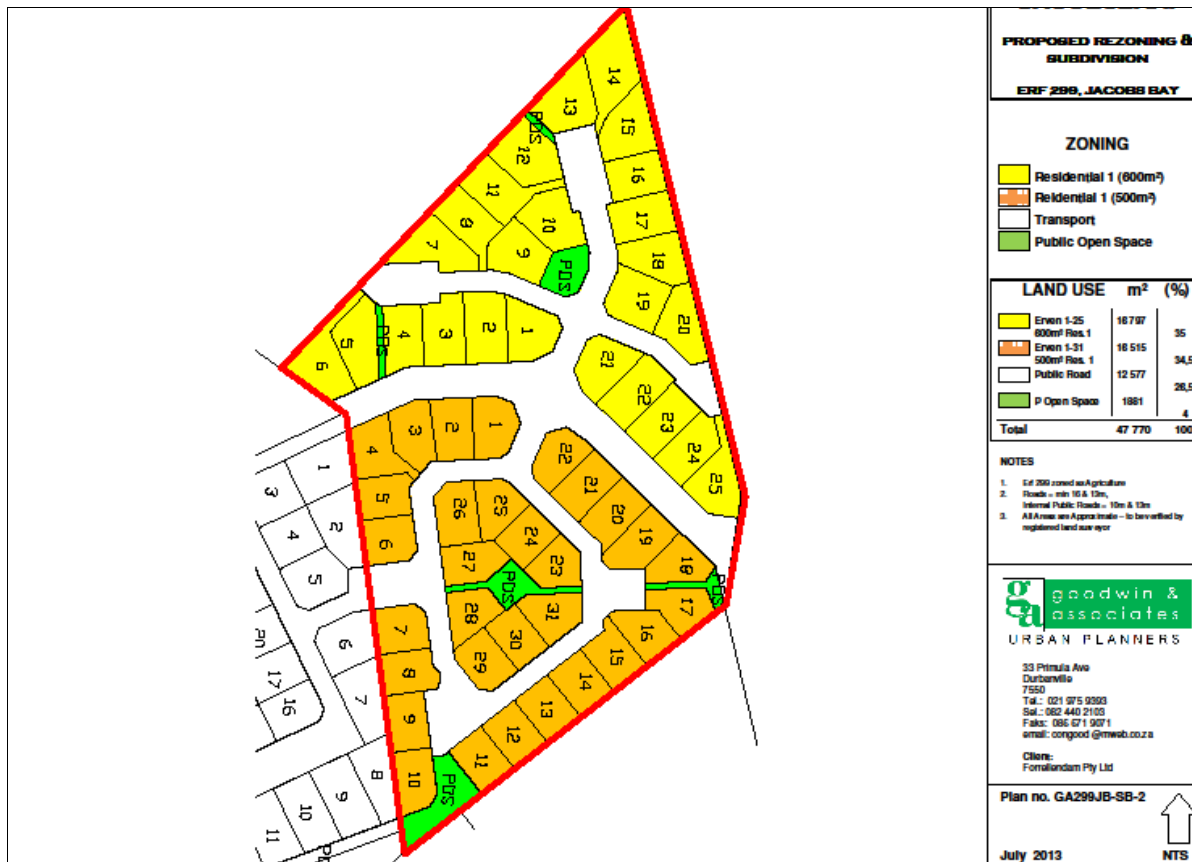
Proposed site development plan for Remainder Erf 299, Jacobsbaai
